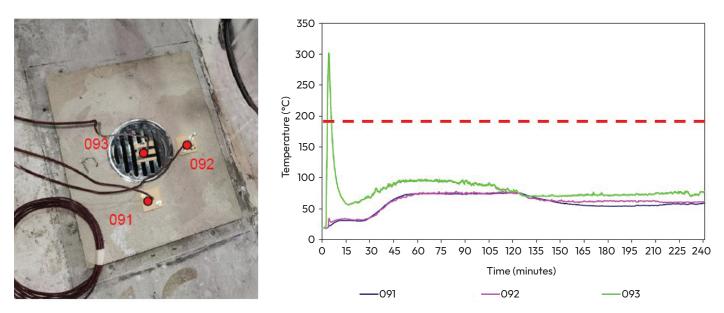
Standard Stack Pipe collar tested on a floor waste configuration.
